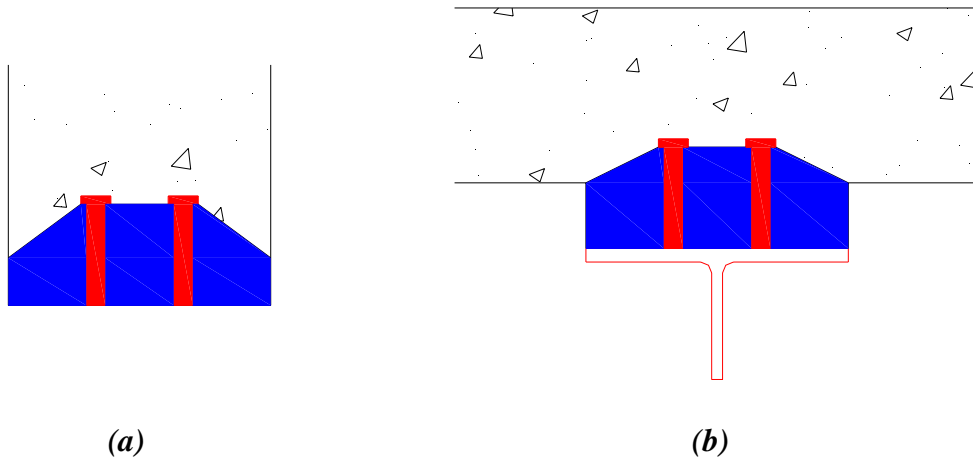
Deck transverse direction – (a) assumed breakout failure; (b) actual breakout failure
